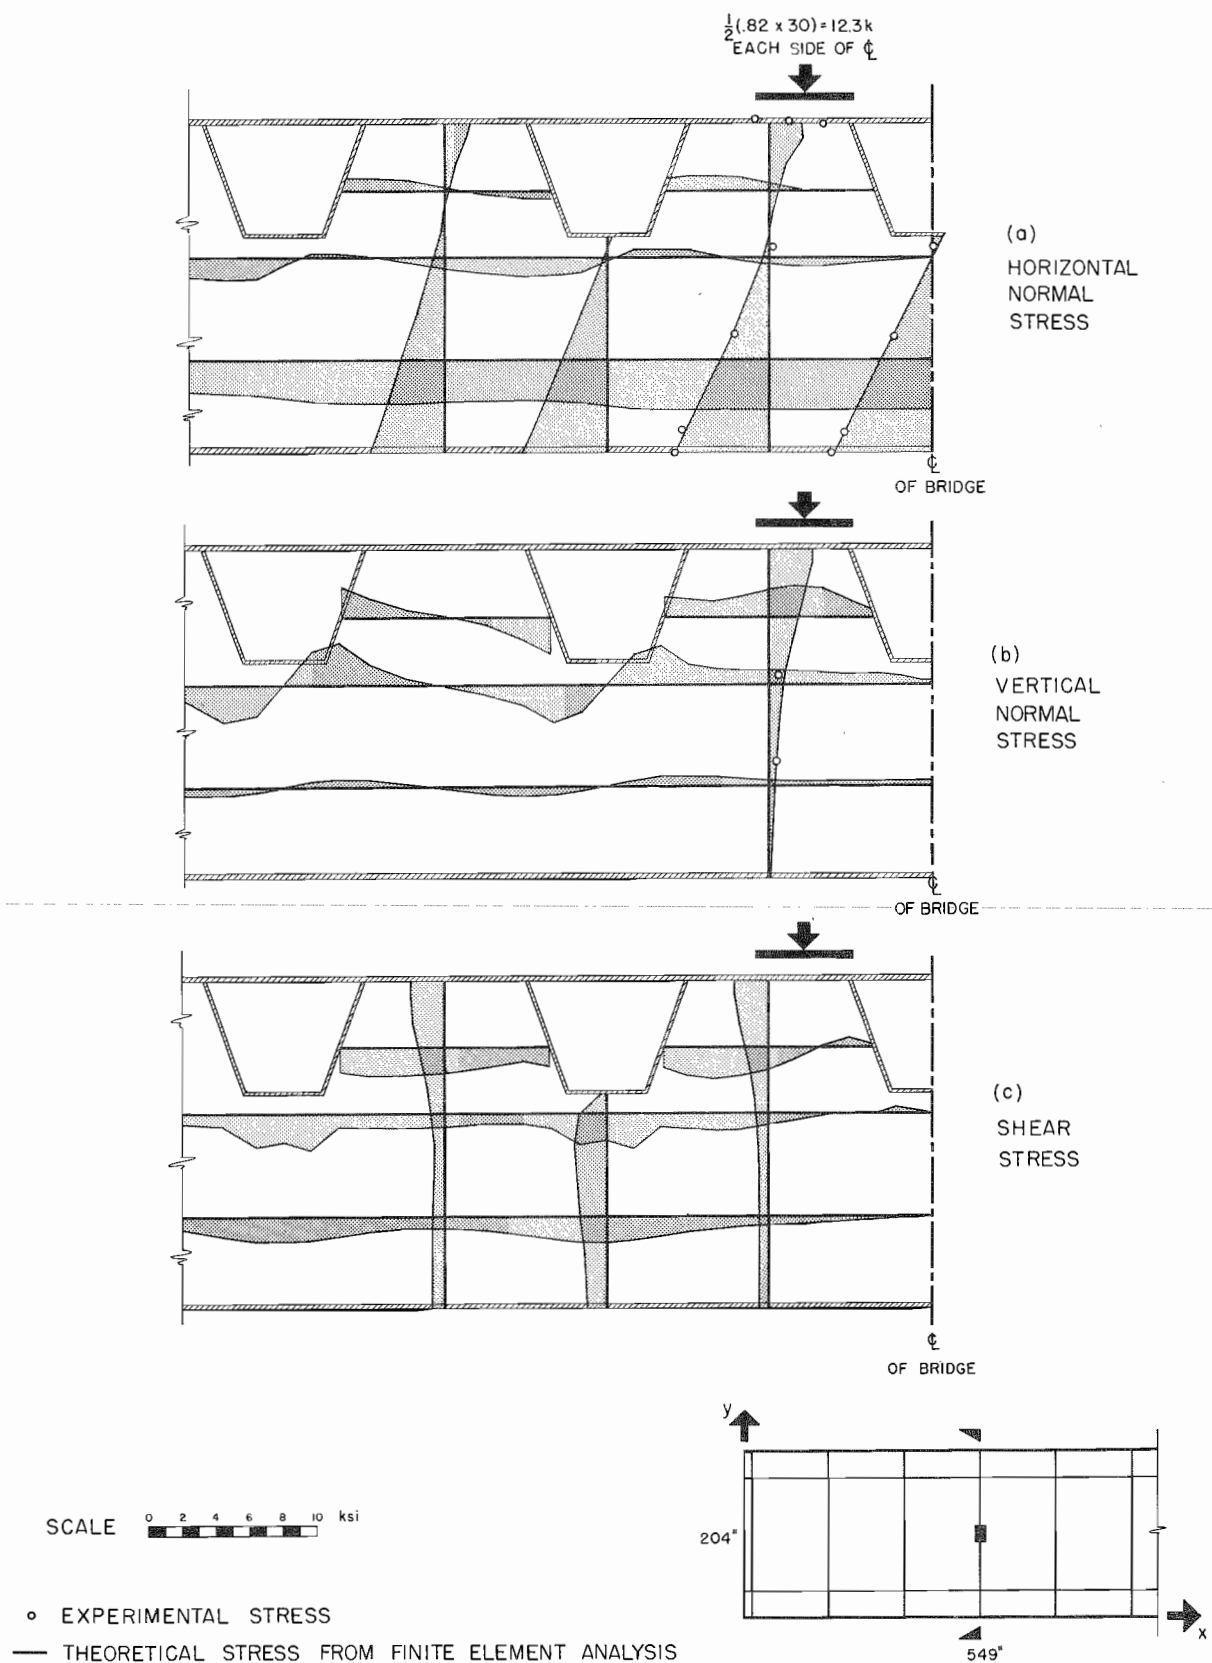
STRESSES IN FLOOR BEAM WEB AND FLANGES, BRIDGE I.
